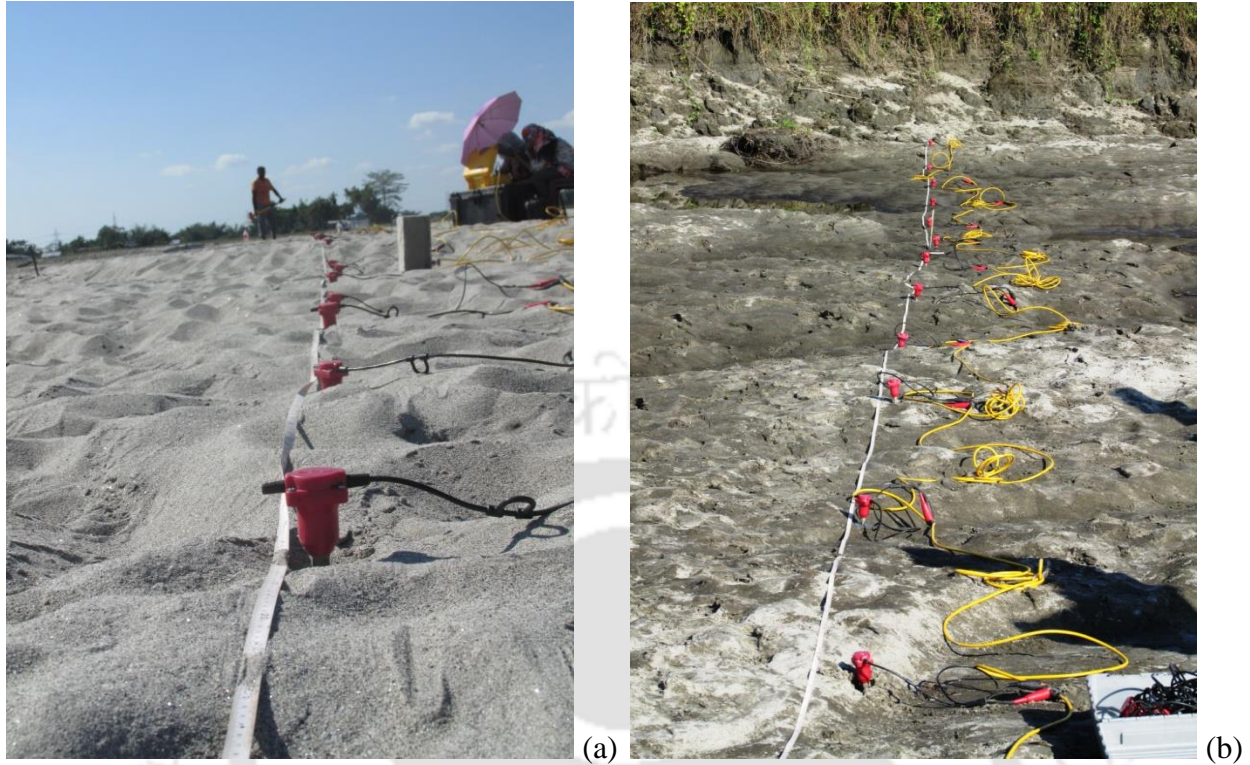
Typical layouts of geophones at locations of (a) Pier P6 (b) Pier P16
